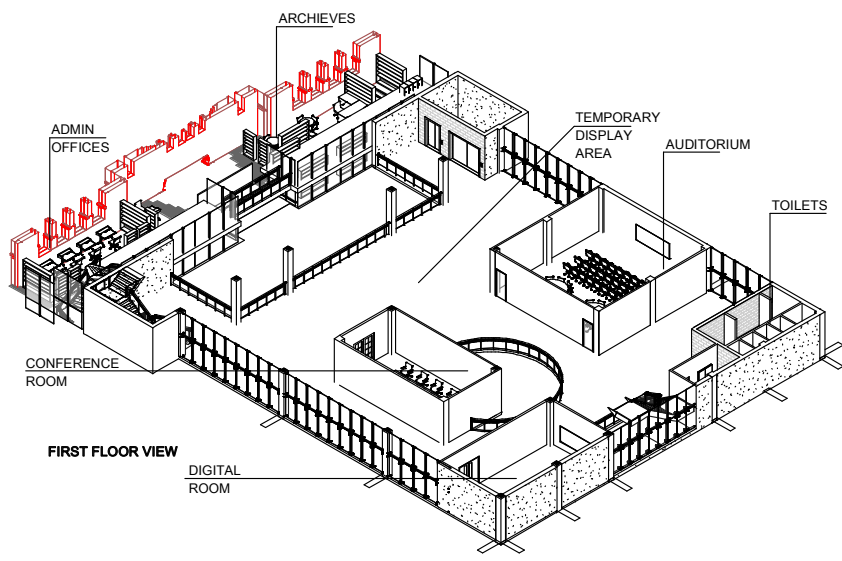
LAKSHMI BUILDING - AXNOMETRIC VIEW - FIRST FLOOR -
